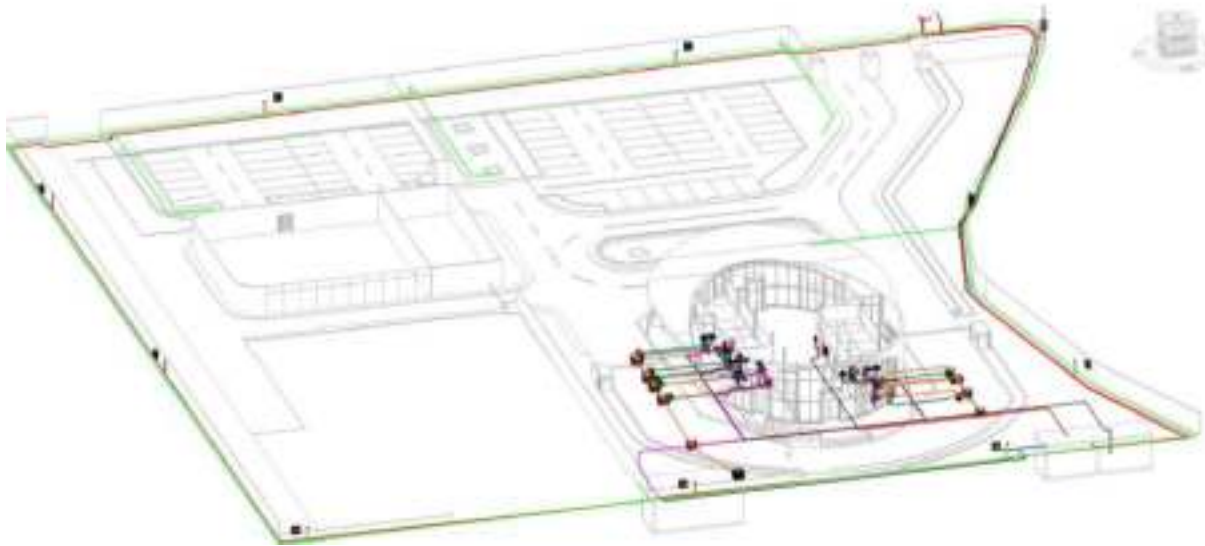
DOMESTIC WATER SUPPLY & SEWAGE DISPOSAL SCHEME LAYOUT
